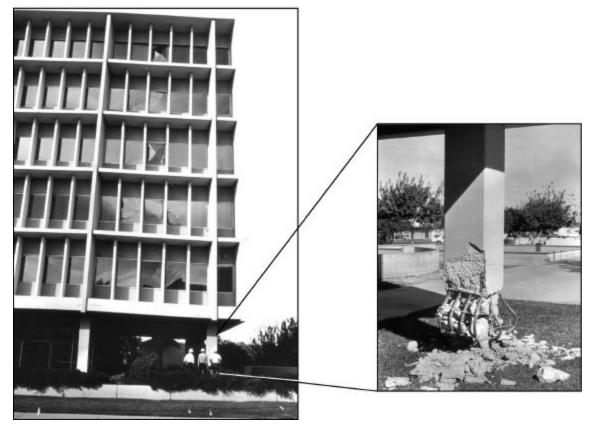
Photos of south face (left) and failed reinforced concrete column (right) at base of Imperial County Services Building, which was damaged by the 1979 Imperial Valley Earthquake. The burst of high frequency motion occurring simultaneously with column failure is shown in Figure 3 (from Rojahn and Mork, 1982).
